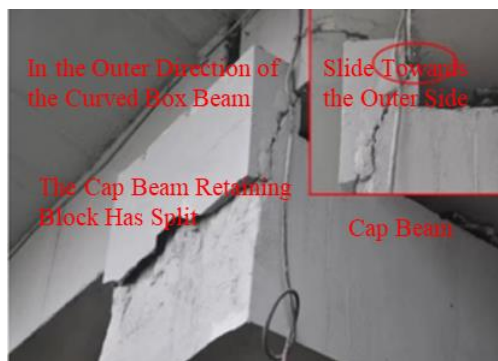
Diagonal splitting of bridge abutment cap beam block
